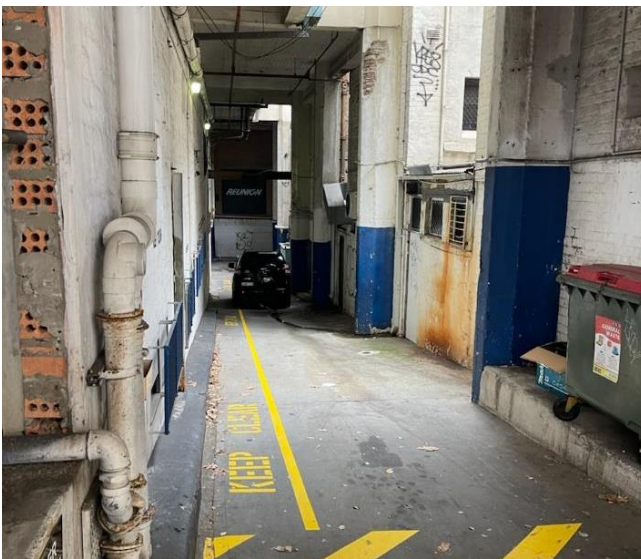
Existing Buildings at 301 and 305 Kent Street (Facing West) Source: Urbis (2022)
